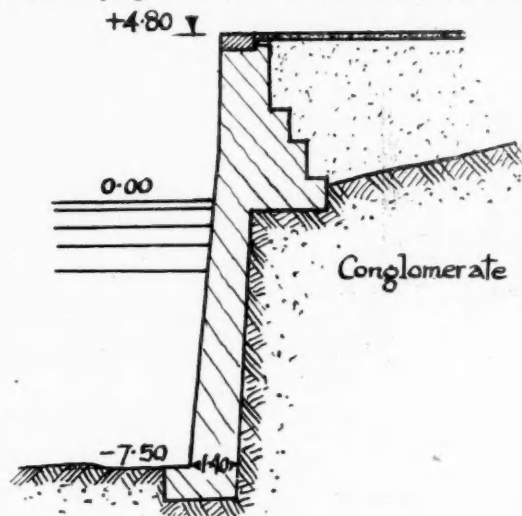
Cross section of the sea wall at the Port of Quequen.
